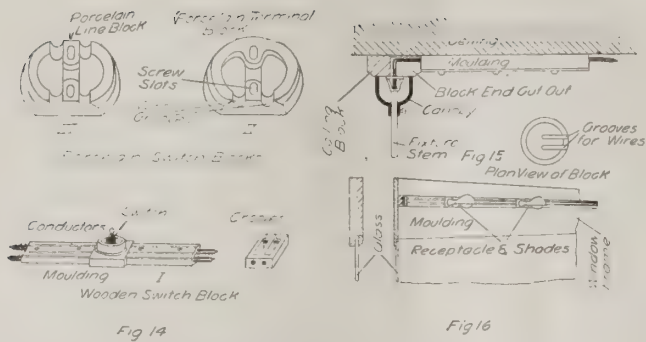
BLOCKS FOR SUPPORTING SWITCHES IN MOULDING INSTALLATIONS. FIG. 15. METHOD OF SUPPORTING A FIXTURE IN MOULDING. FIG. 16. MOULDING FOR SHOW WINDOW WIRING.
